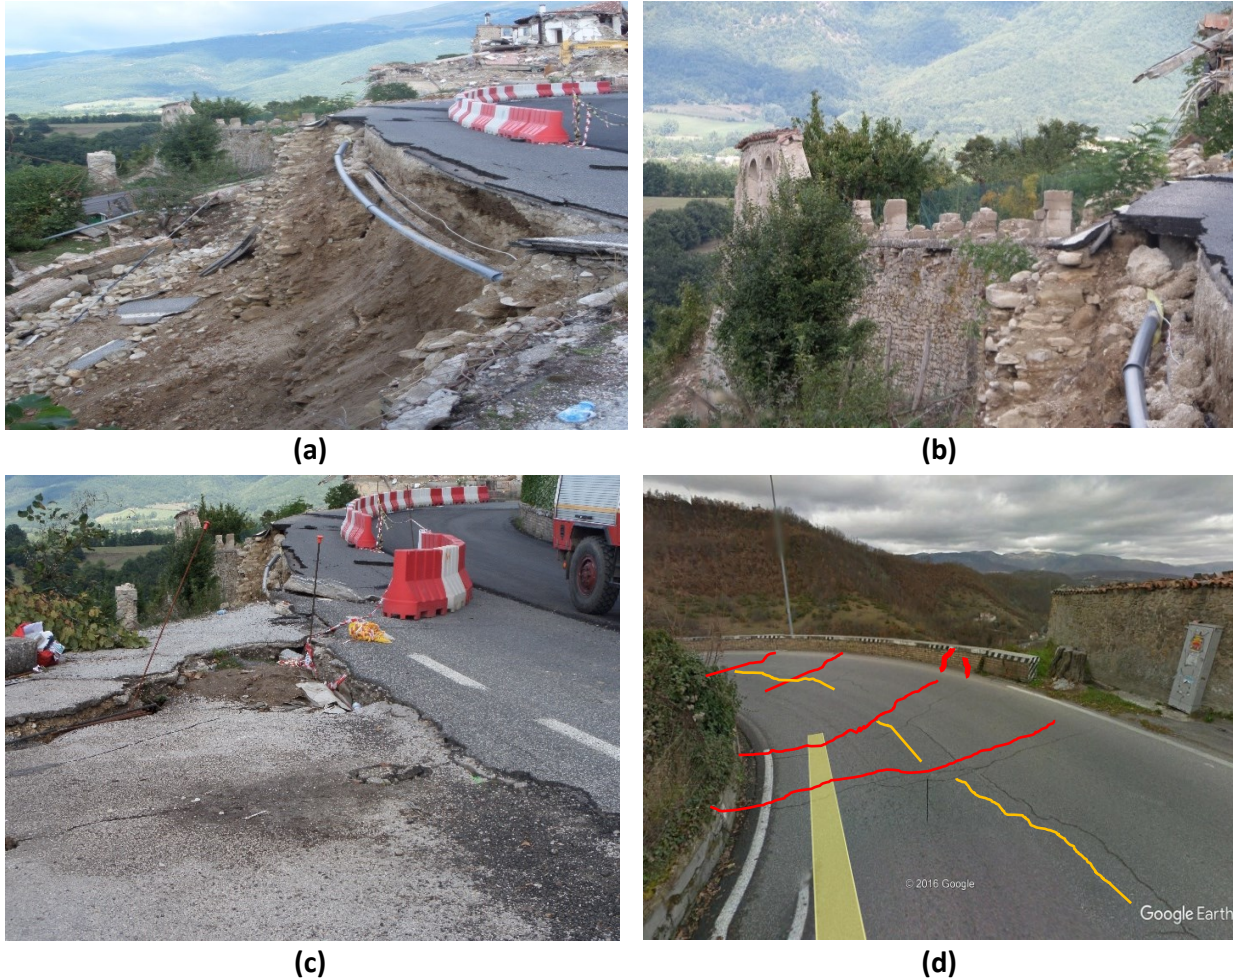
Retaining wall along the SS260 road close to Amatrice urban area (42.629533N, 13.286448E): (a) collapse of the wall, (b) detail of the stone masonry texture, (c) cracks along the unpaved portion of the road, (d) Google Earth (July 2011) view of the SS260 road before the earthquake, with evidences of diffuse cracks along the asphalt.
